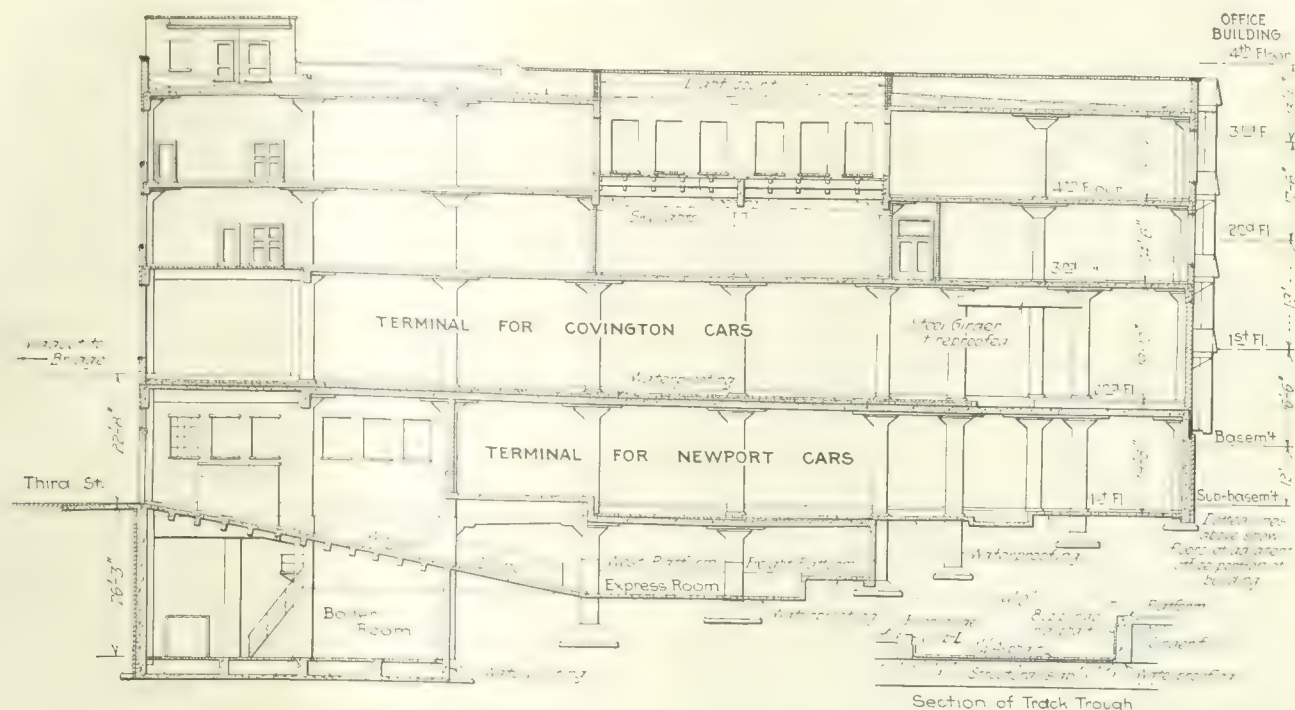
CROSS-SECTION OF TERMINAL BUILDING
